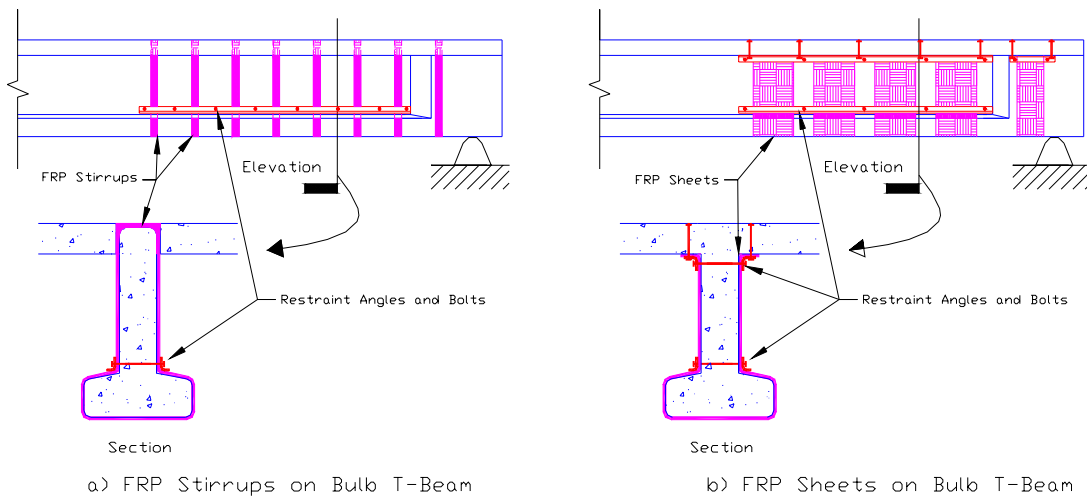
Typical shear strengthening of AASHTO-type girder bridge
